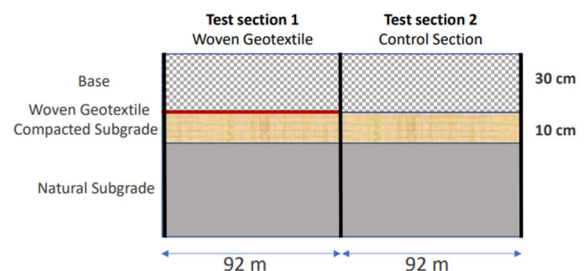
Cross-sectional layouts of the woven geotextile-stabilized and control test sections in Buchanan County, Iowa.
